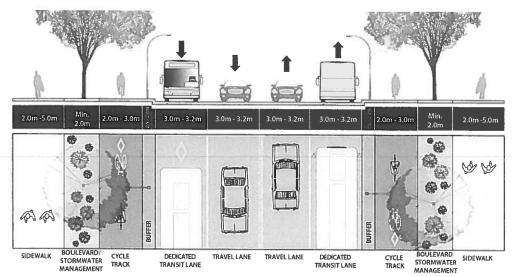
Shelbourne Street Right-of-Way Long-Term Ultimate Design Concept
